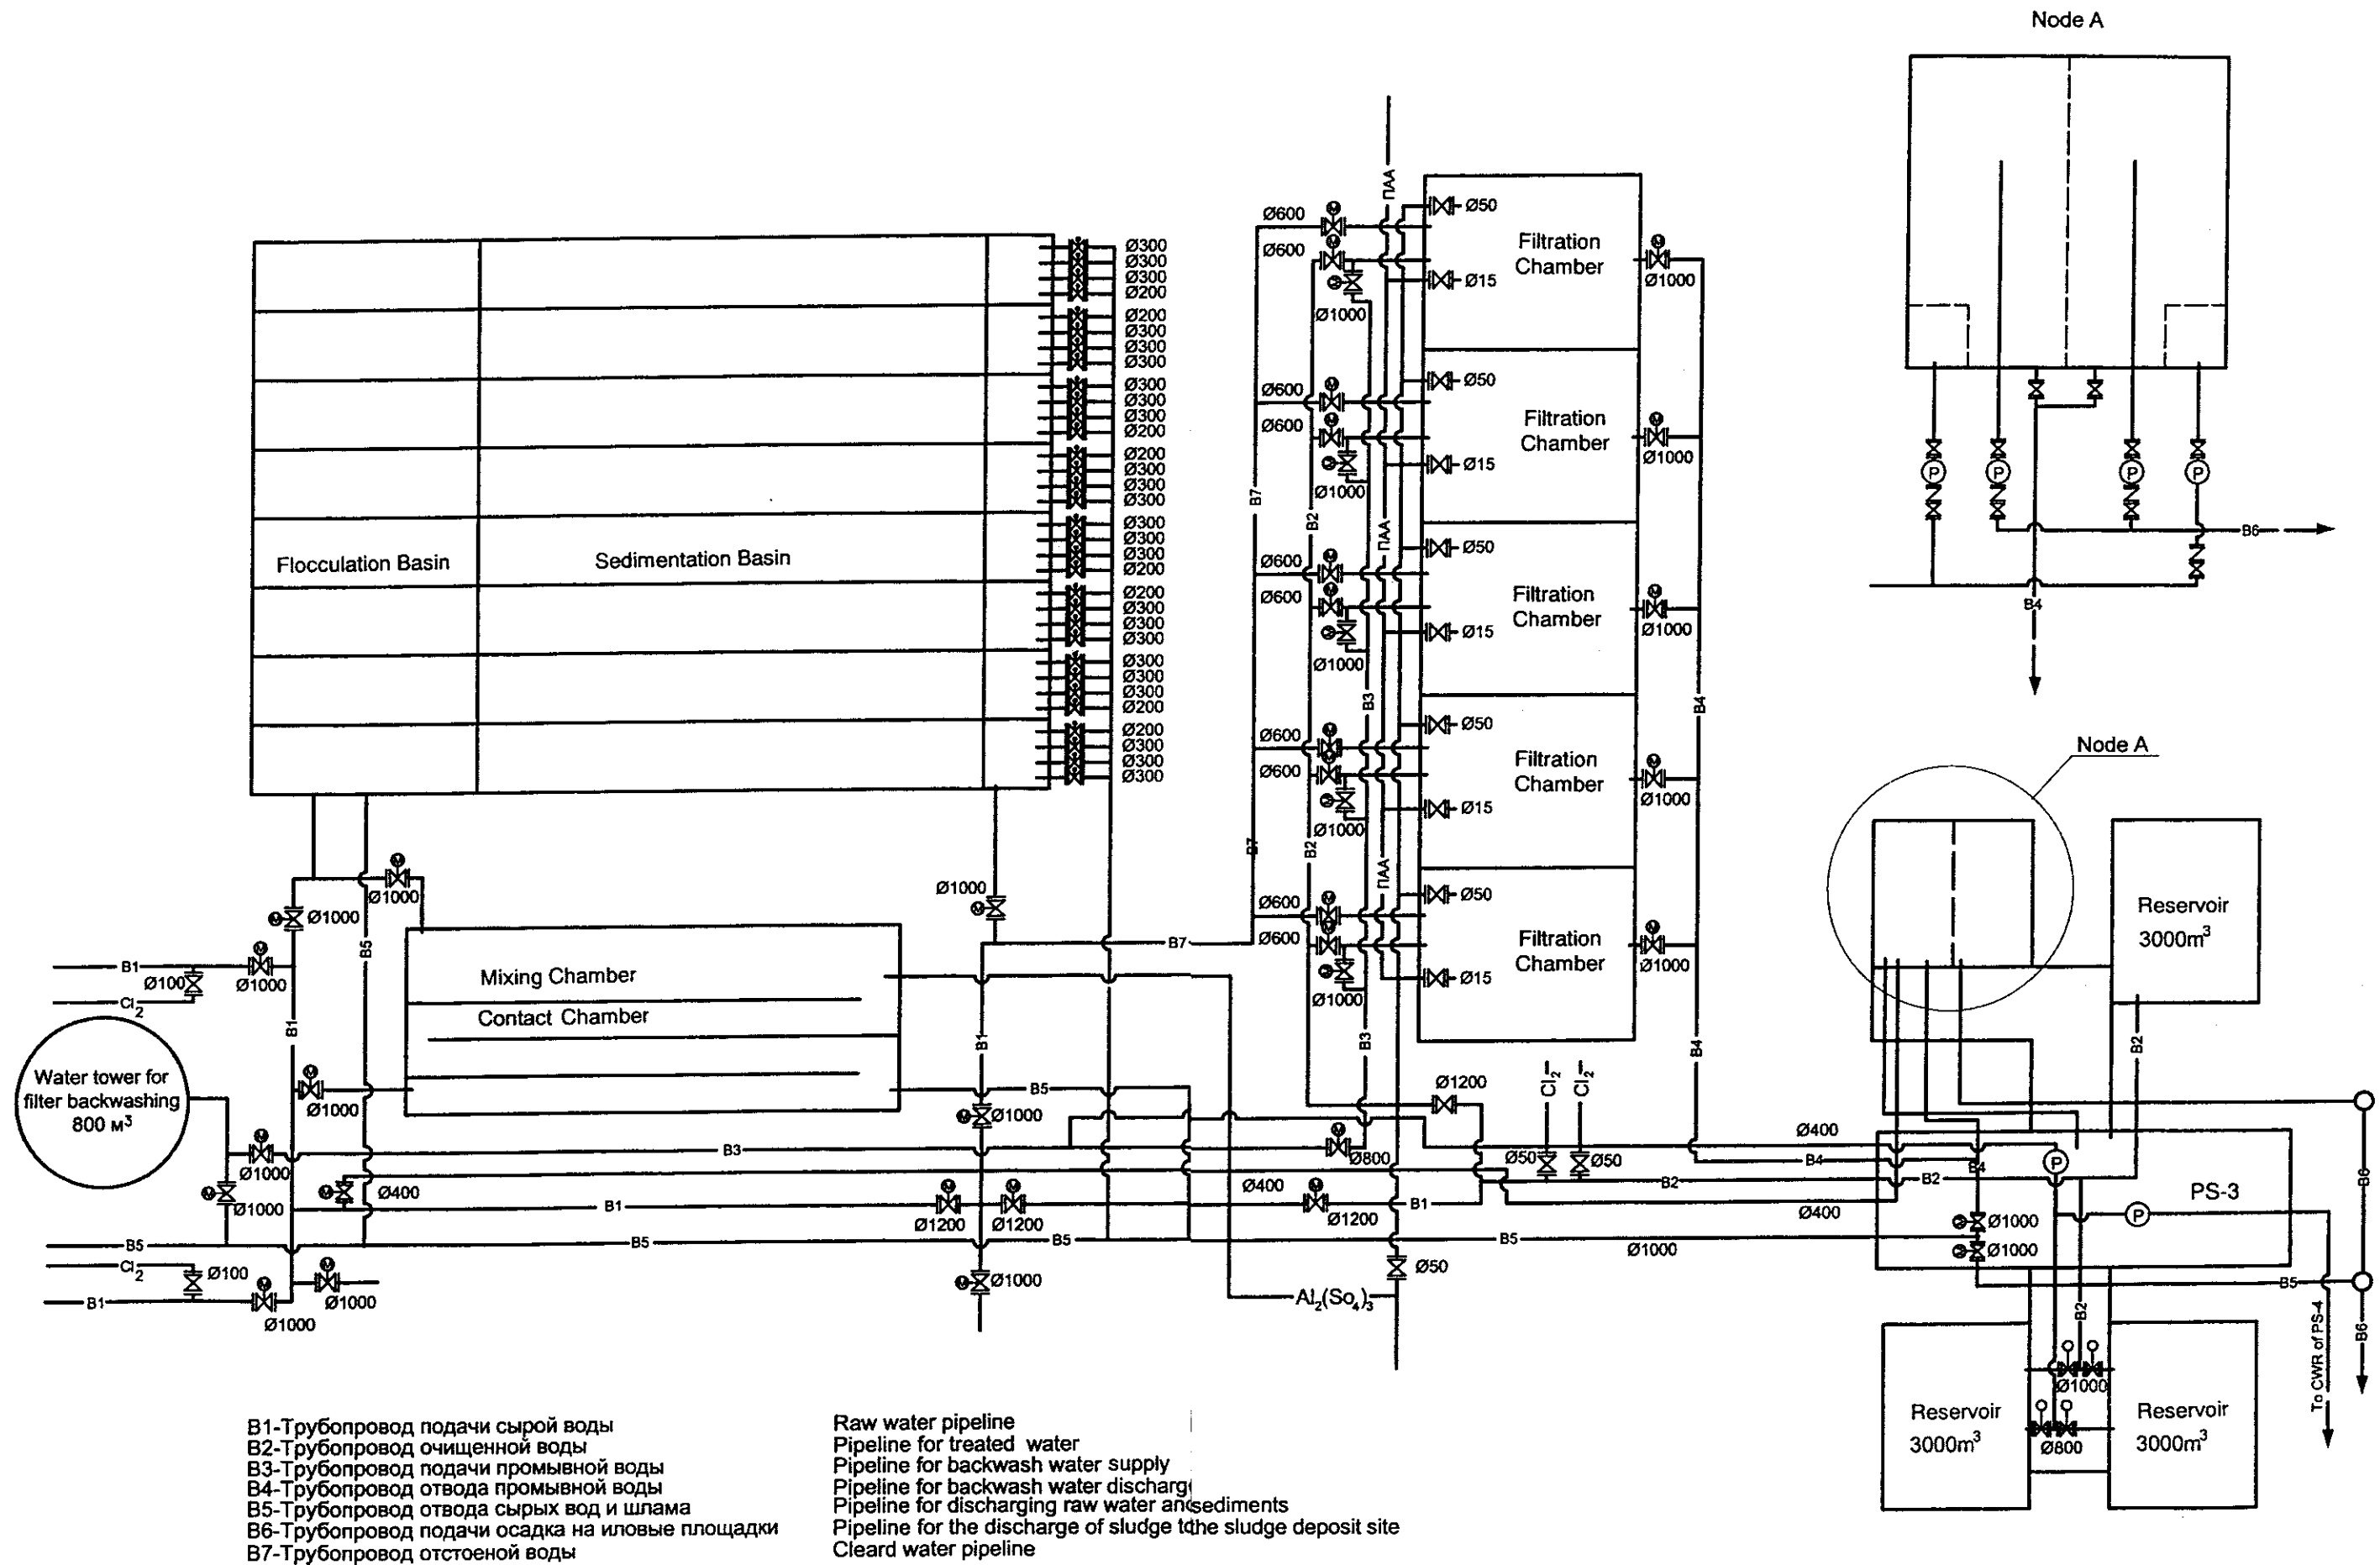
Plan of Apa-Canal Soroa-Balti Water Treatment Plant
